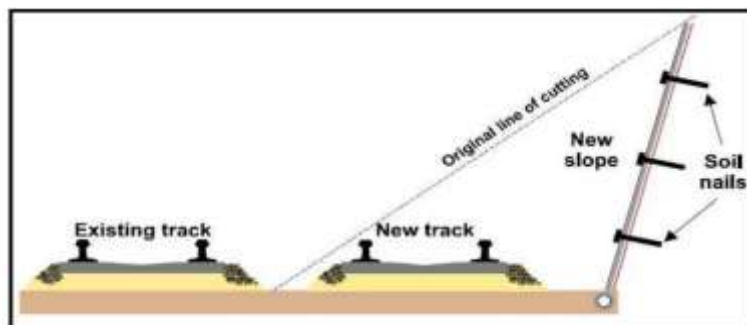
soil nailing used in railway construction for laying new tracks adjoining blocks 1.1 various types of soil nailing
